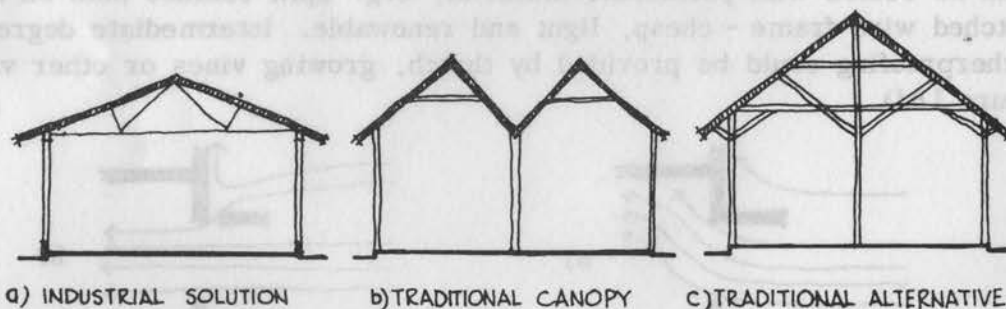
ALTERNATIVE FORMS OF ROOF FRAMING
